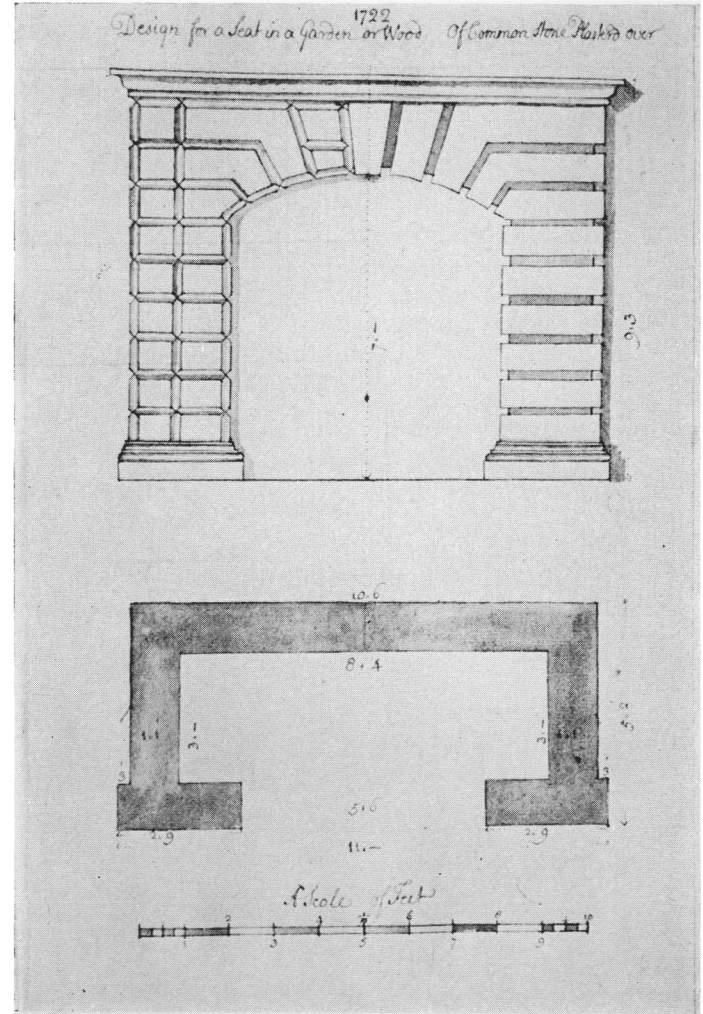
Plan and elevation of a garden alcove seat, 1722 [50]
